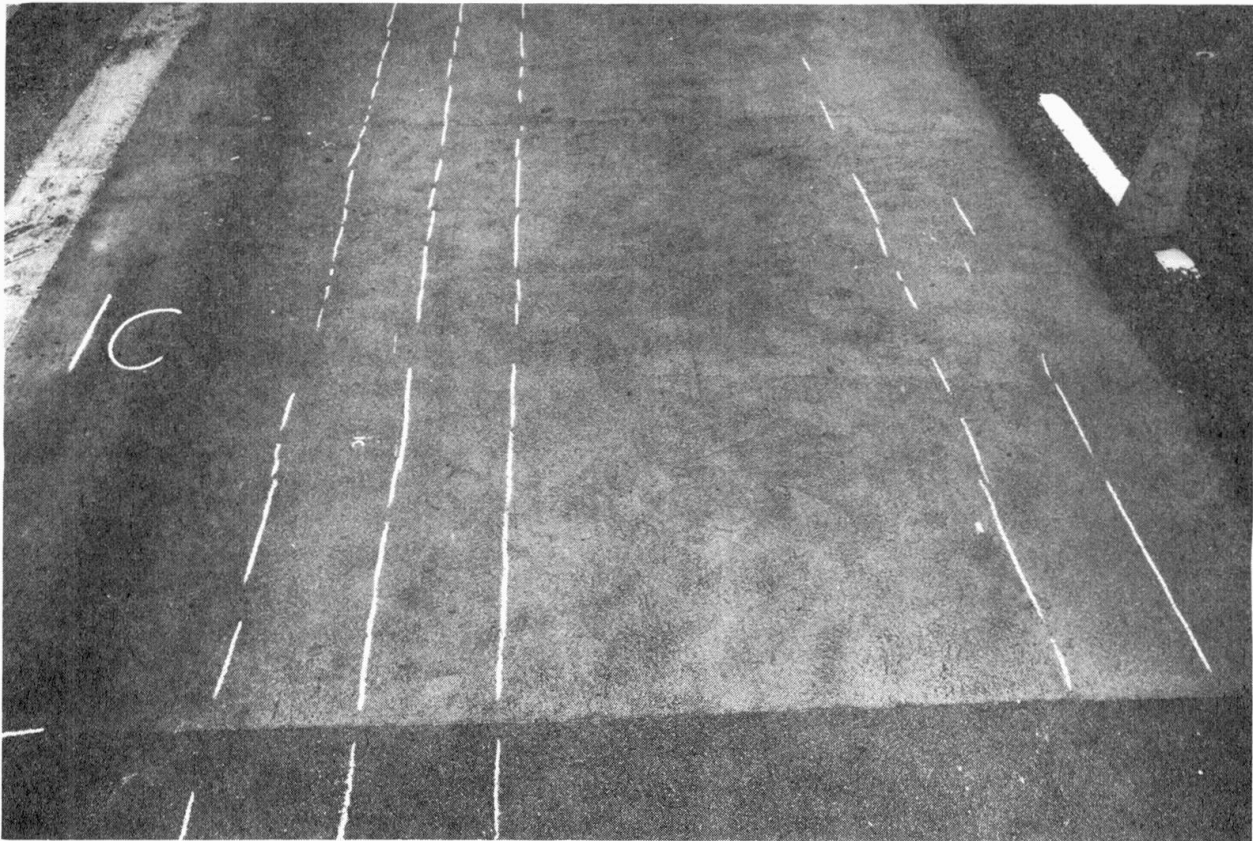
CRACKING IN EPOXY RESIN SURFACING ON SECTION 1C, NOVEMBER, 1967
